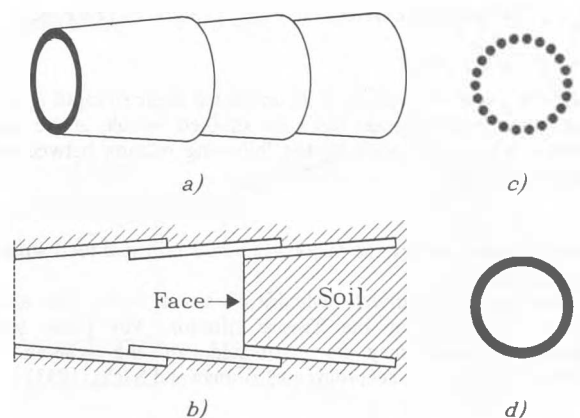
Typical features of a protective “shell” or “umbrella”. a) Axonometry. b) Vertical longitudinal section. c) Shell formed by micropiles or by jet-grouted columns (cross section). d) Continuous cast-in place concrete shell (“Pretunnel”).
